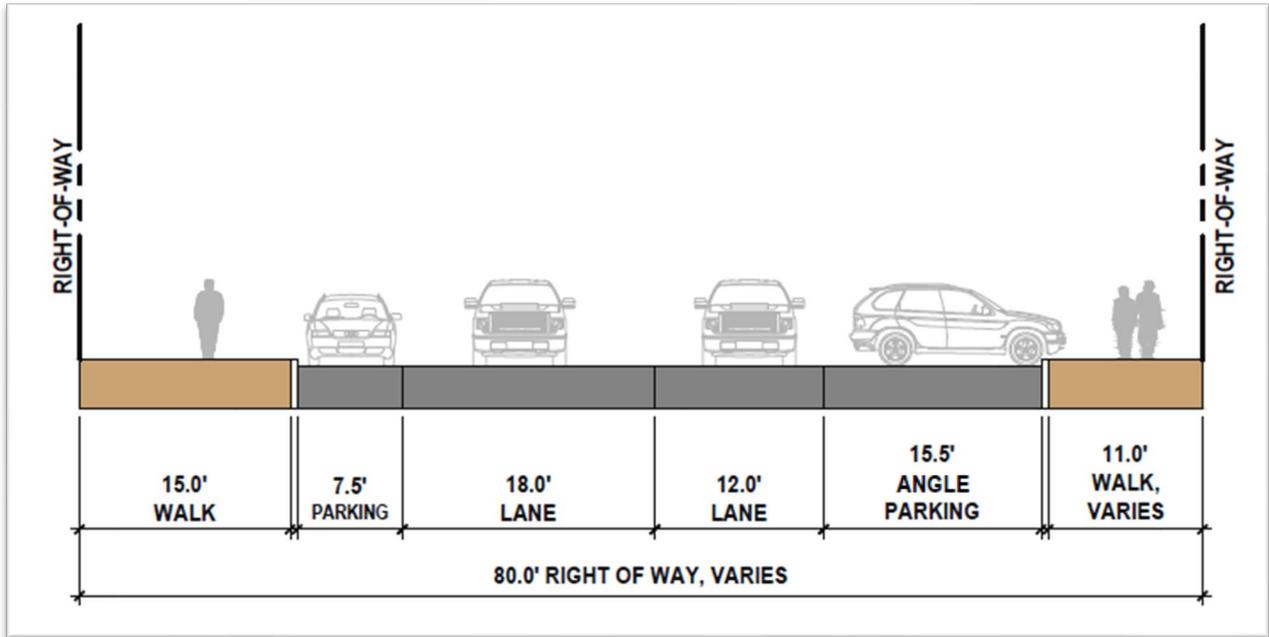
4th St - Existing Cross-Sections Between Ute Ave & Colorado Ave
